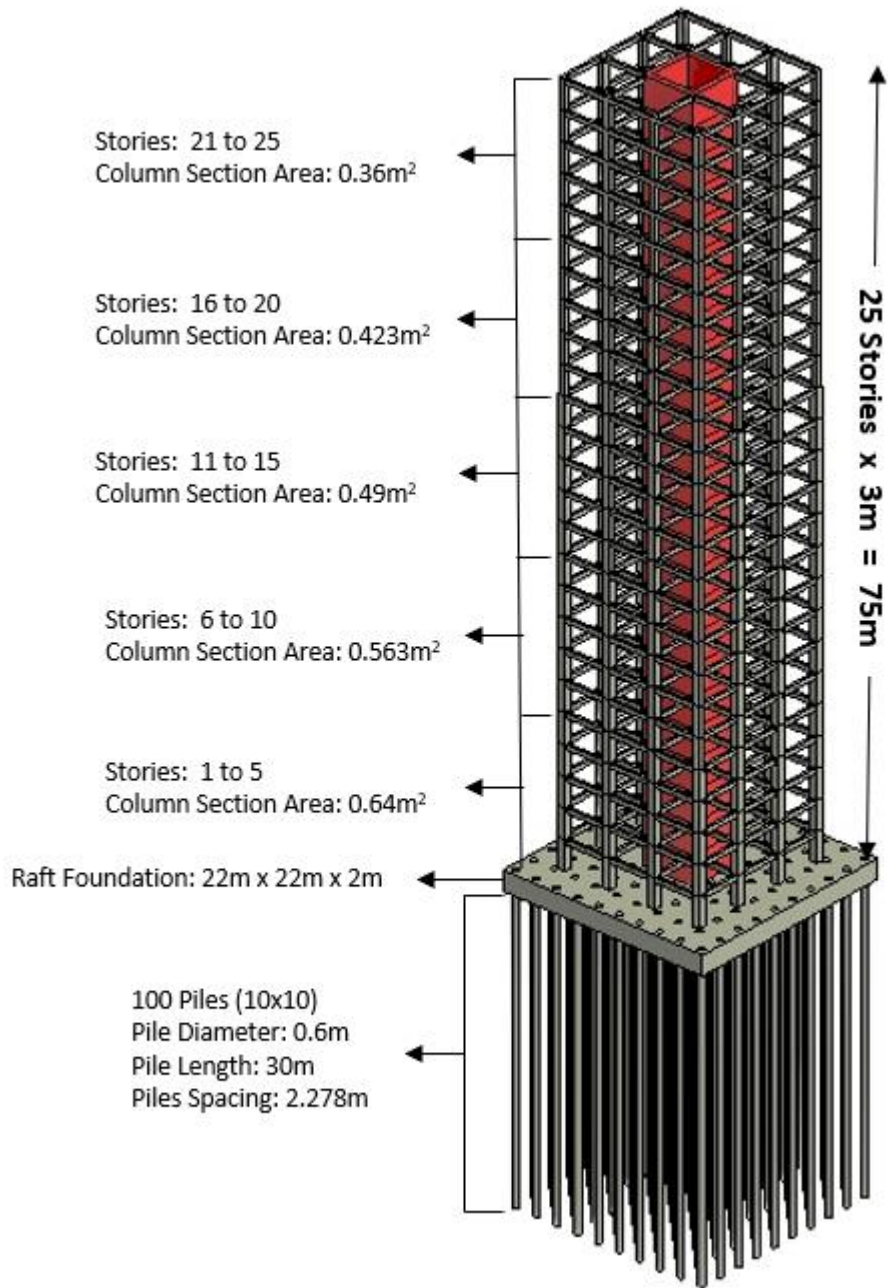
Designed structural sections of the 25-storey building used in the analysis
